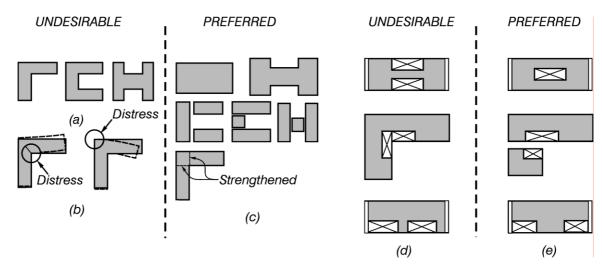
Building plan configurations (after Paulay and Priestley, 1992)
